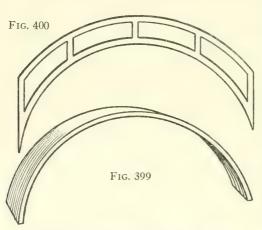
Roadbed of Japanese Bridge Fig. 400. — Railing for Bridge
